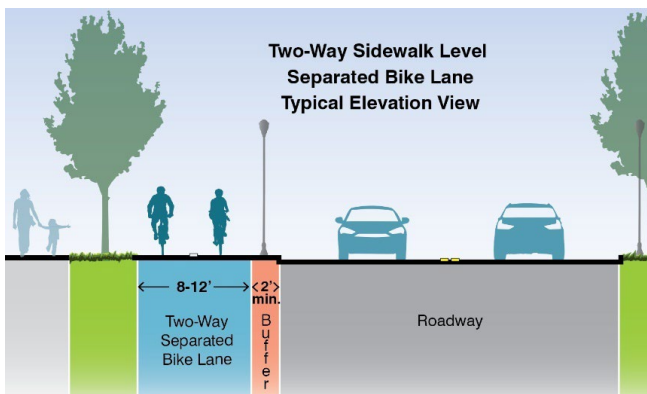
Two-Way Separated Bike Lane at Sidewalk Level
